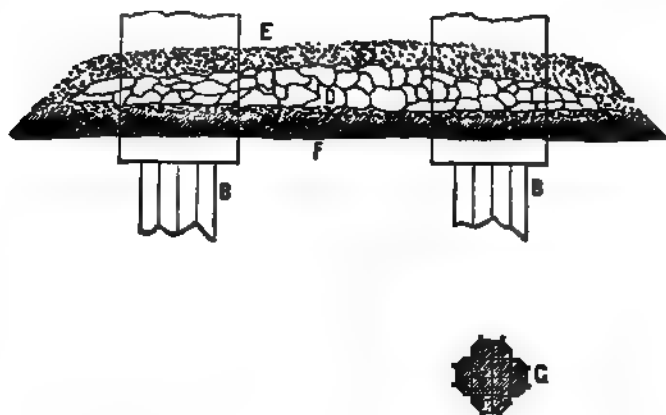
represents a section and elevation of a pier of the Beekun river bridge.
